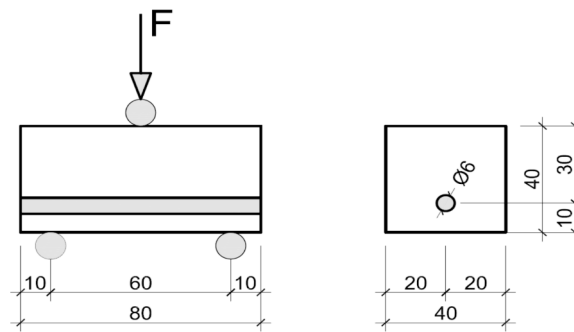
Geometry of short concrete beam reinforced with one longitudinal steel ribbed bar (dimensions are given in [mm]) [51].
